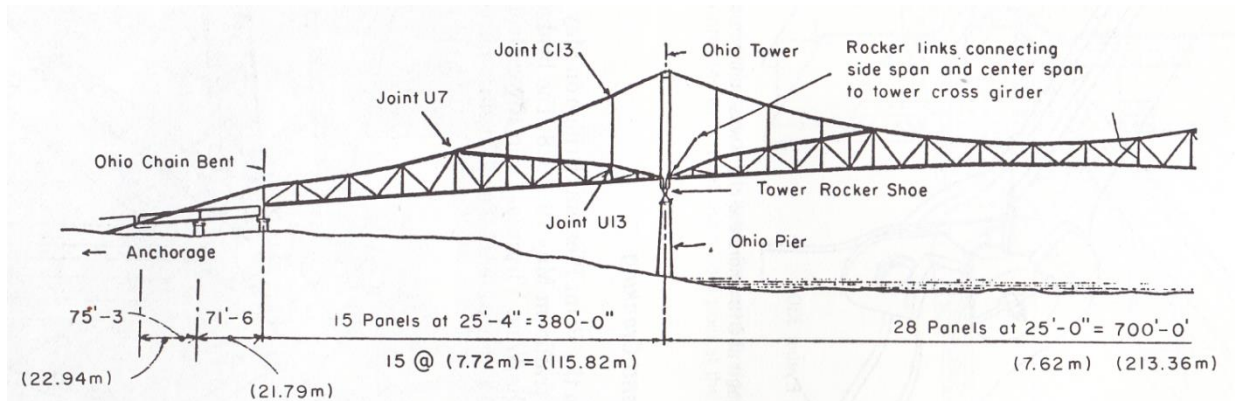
Schematic elevation view of the Silver Bridge (Fisher, 1984).
